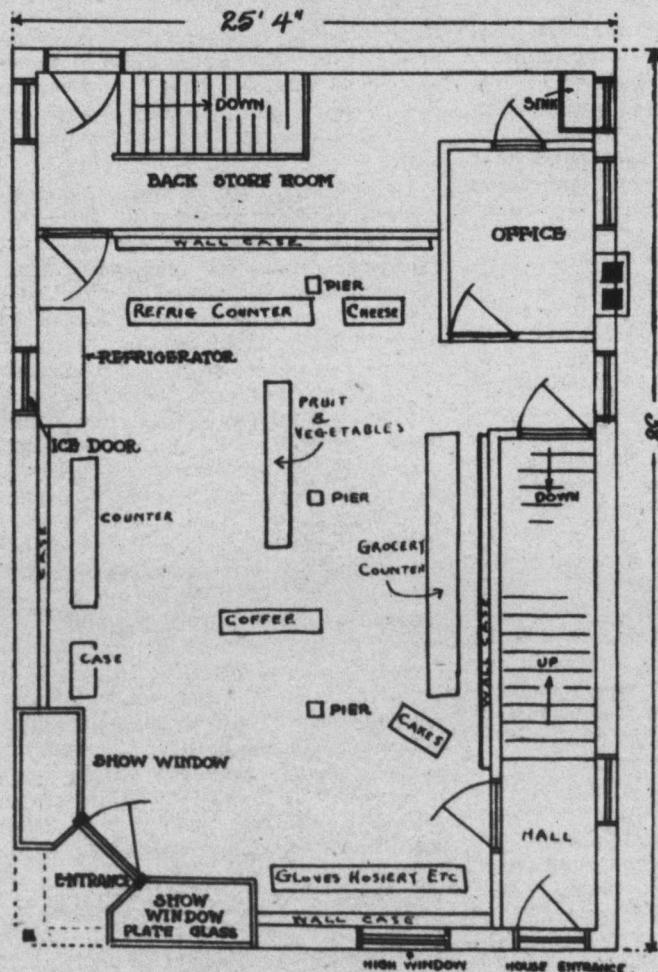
The original floor plan of A. R. Latter's store, Stratford, Ont., with suggestions for layout of store furniture.
